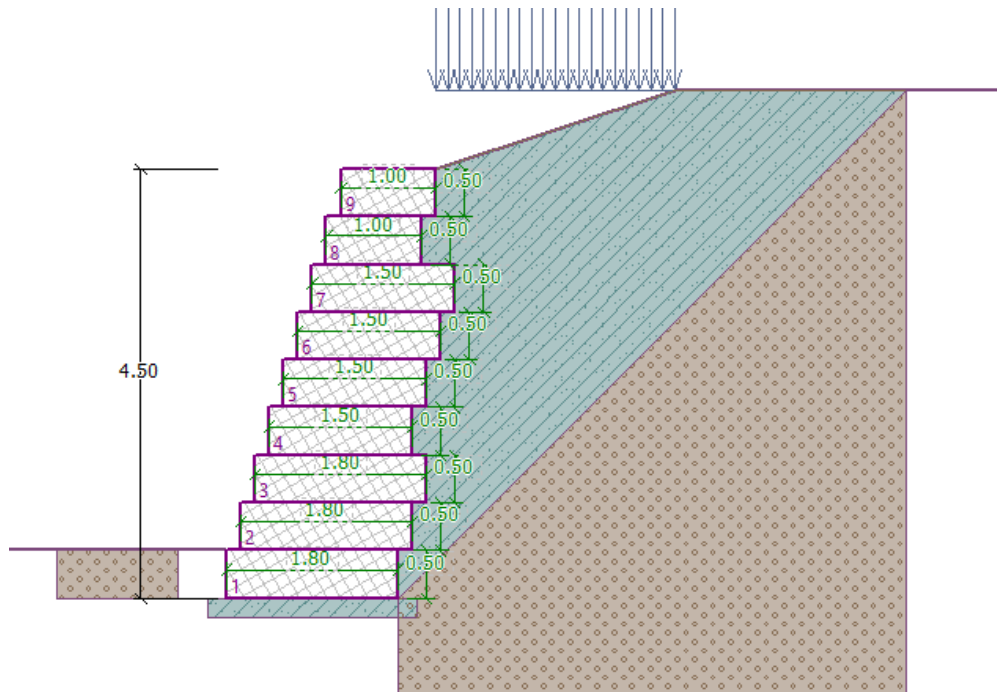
Sample of Category 4 Retaining Wall with a 3:1 Slope Behind
